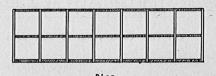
Typical construction scheme showing precast cross-walls and brick facades
